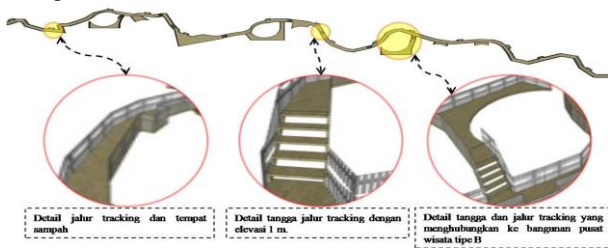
(Top) tracking path for accessibility; (Left) detail of tracking path and trash; (Middle) detail of stairs in tracking path with an elevation of 1 m.; (Right) Detail of stairs and tracking path that connects to the stage building.
